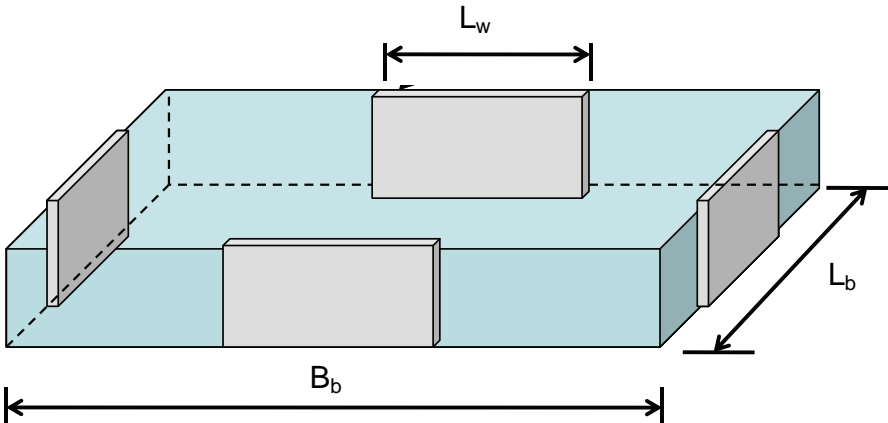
Plan configuration for reinforced concrete shear wall archetypes.
